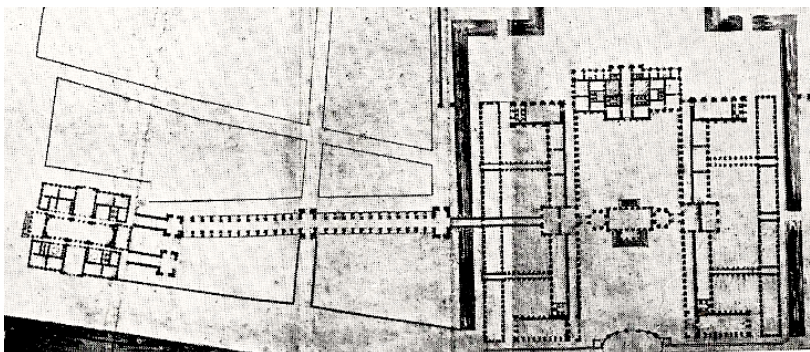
Whitehall Palace plan, 1st great design, Houses of Parliament shown on far left (Image: Sekler, Eduard. *Wren and His Place in European Architecture*. London: Faber & Faber, 1956.)
